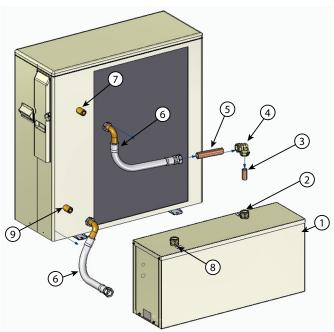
External volumiser connection to HPID10R32 heat pump (exploded image)
